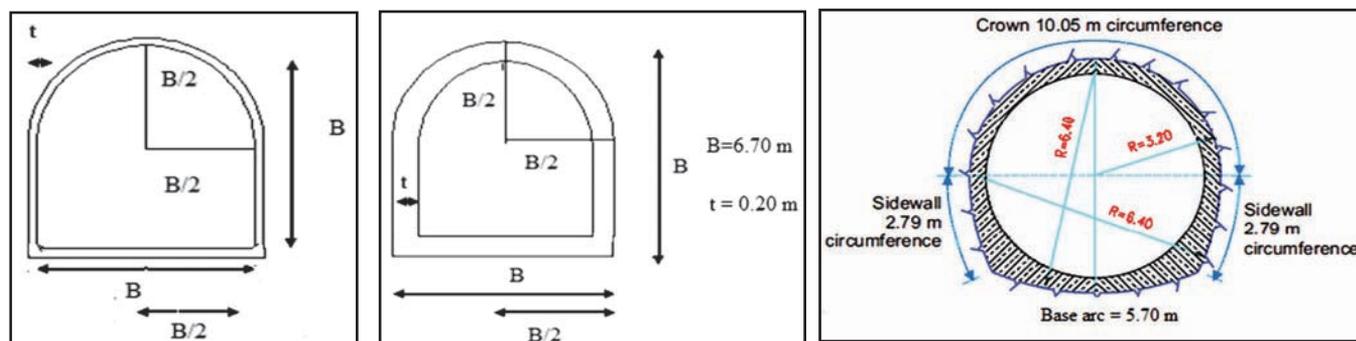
Proposed shortcrete lined and concrete line sections (left and middle) and existing concrete line section (right)
